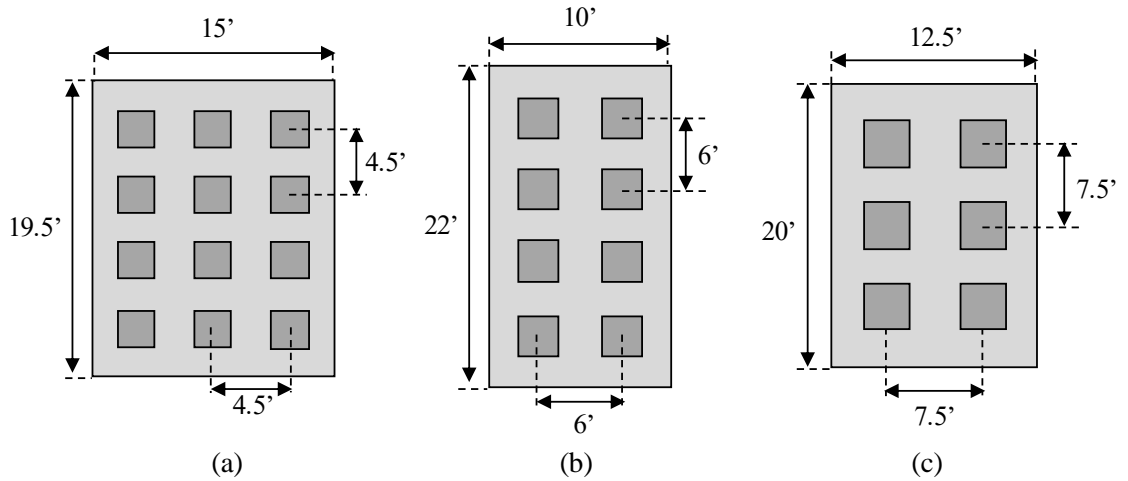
Pile layouts used for Bridge #4 with (a) 3x4 grid of 18-inch piles, (b) 2x4 grid of 24-inch piles and (c) 2x3 grid of 30-inch piles
